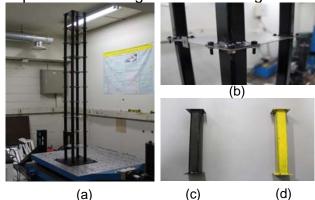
(a) Experimental model (b) Connection between columns and floors (c) Intact column (d) Damage column
